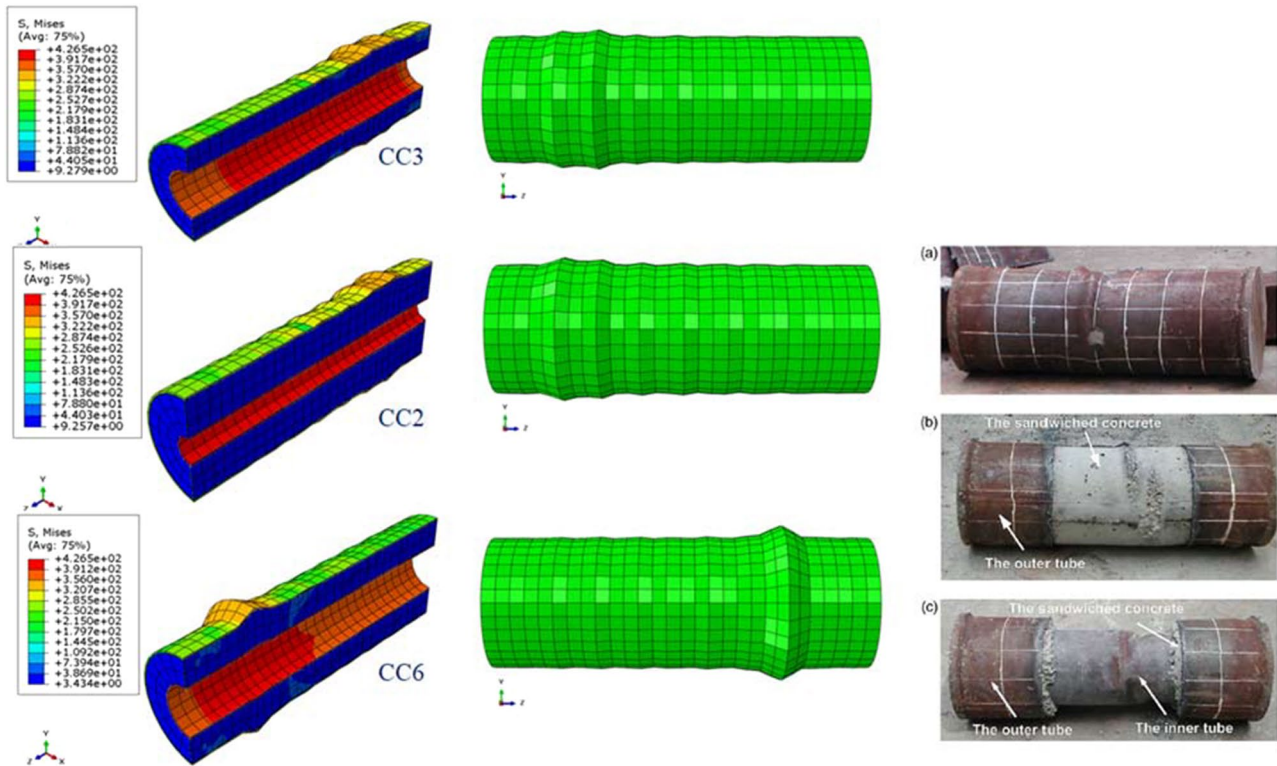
Typical failure mode of CFDST stub column. (a) typical specimen after testing; (b) after removal of partial outer steel tube; (c) failure mode of the inner CHA in CFDST
